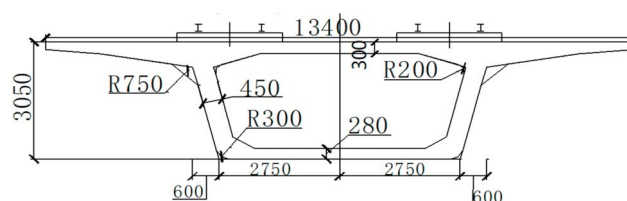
Sectional dimensions of the PC box girder (unit: mm).
